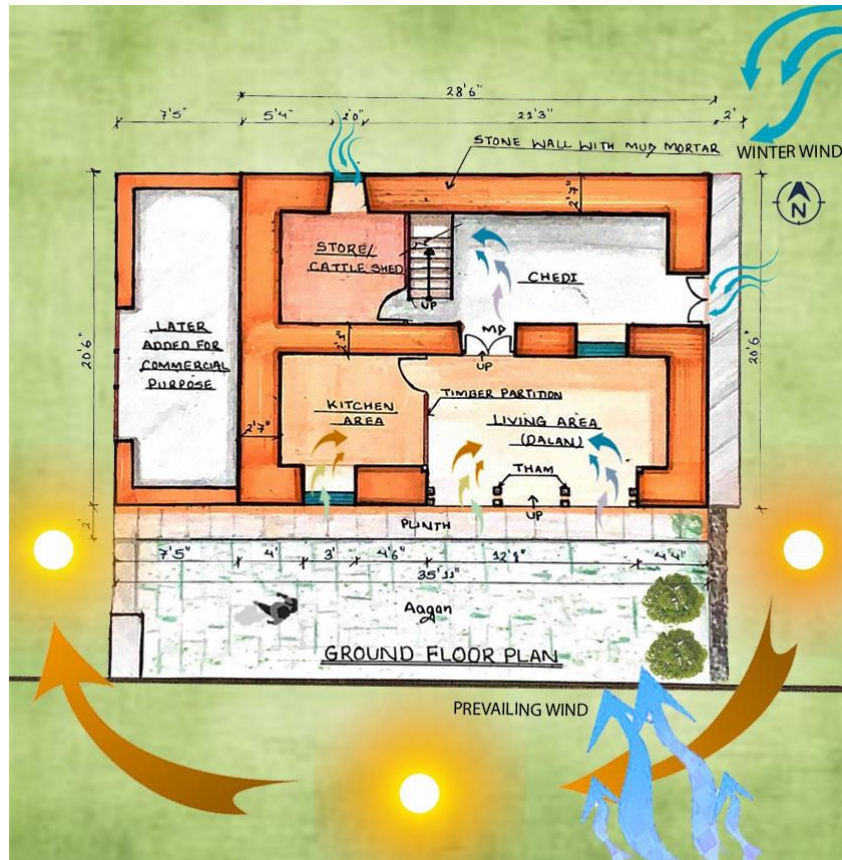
Ground Floor Plan of Traditional House with sun path diagram
